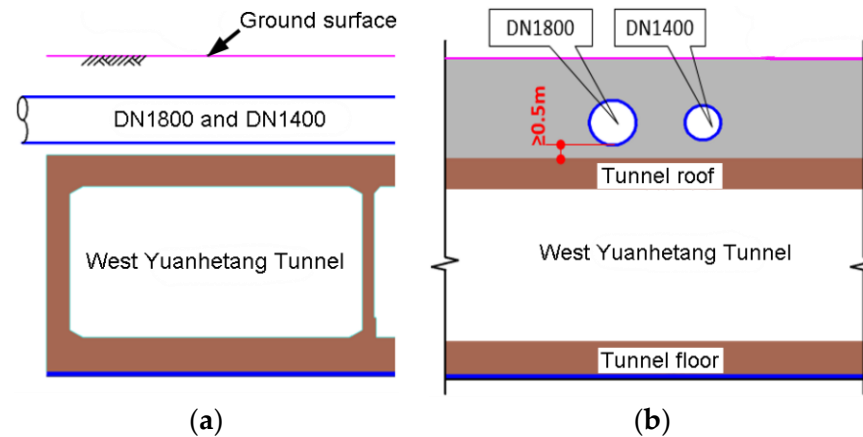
Schematic diagram of the relative position between pipelines and tunnel: (a) Transverse section; (b) Longitudinal section.
